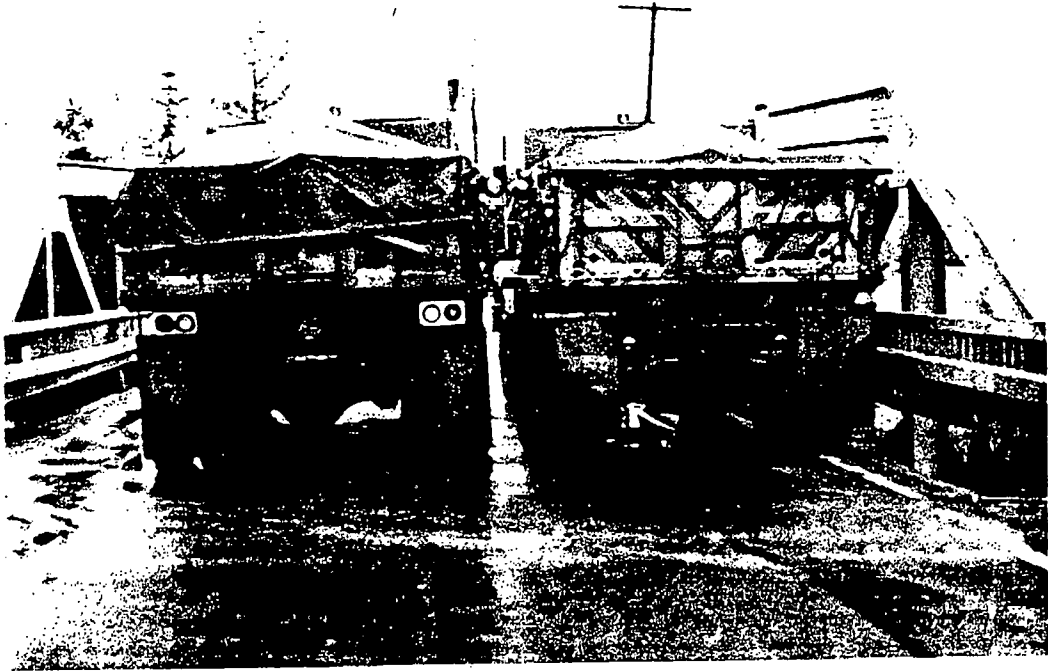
Dump trucks, filled with sand, used by the New York State DOT for load testing of bridges.
